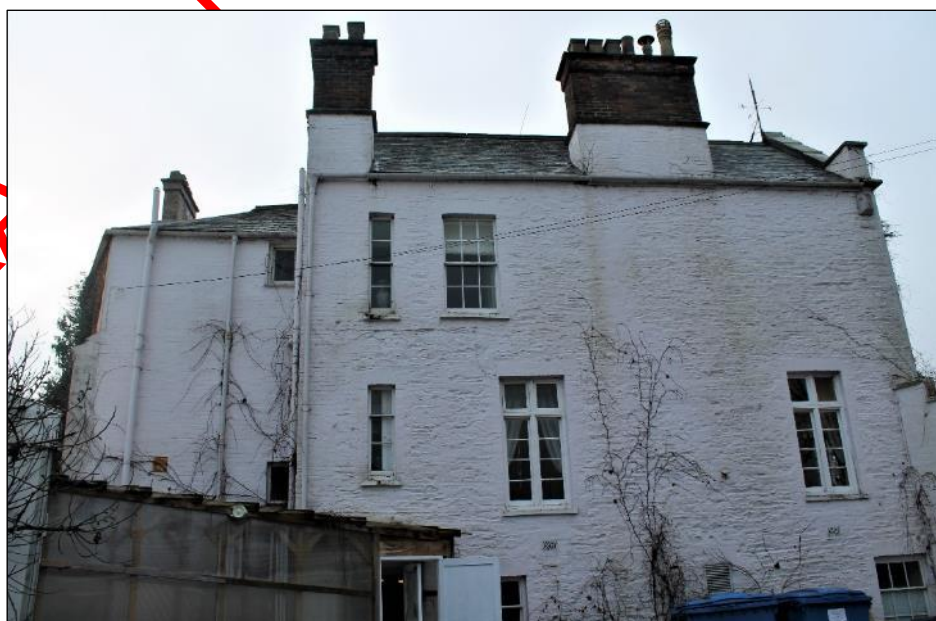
Northern elevation of Woodlands Castle (view from courtyard)
